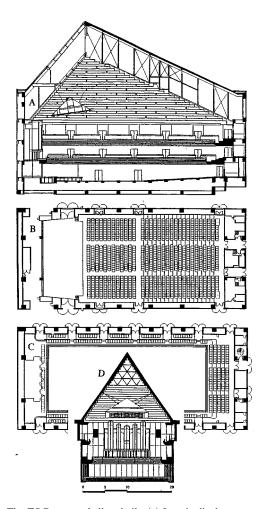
The TOC concert hall as built: (a) Longitudinal cross section. (b) Main floor. (c) First balcony. (d) Lateral cross section at highest ceiling point. The second balcony is similar to the first, except it has three rows of seats at the rear. Many variations were presented originally by the architect for acoustical evaluation. Architect: Takahiko Yanagisawa, TAK Associated Architects, Tokyo.
